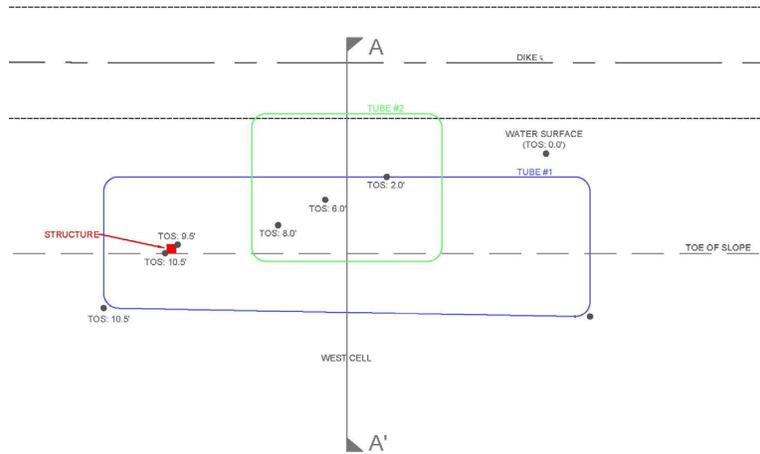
As-Built Pilot Test Plan View (Ref. 4)
